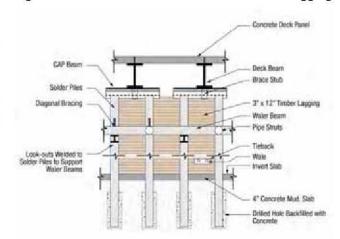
Cut and Cover with Soldier Pile and Lagging
